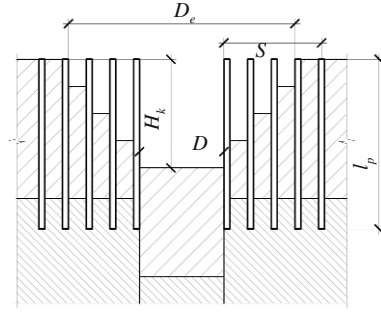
Strip pile footing on subsoil with a karst sinkhole.
